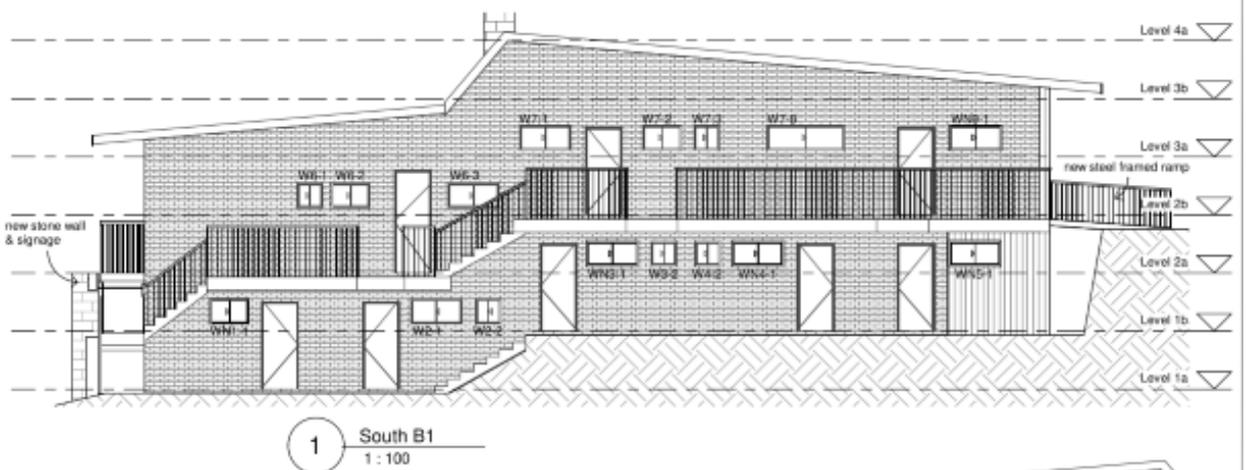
Proposed southern elevation Building 1, including replacement elevated ramp
